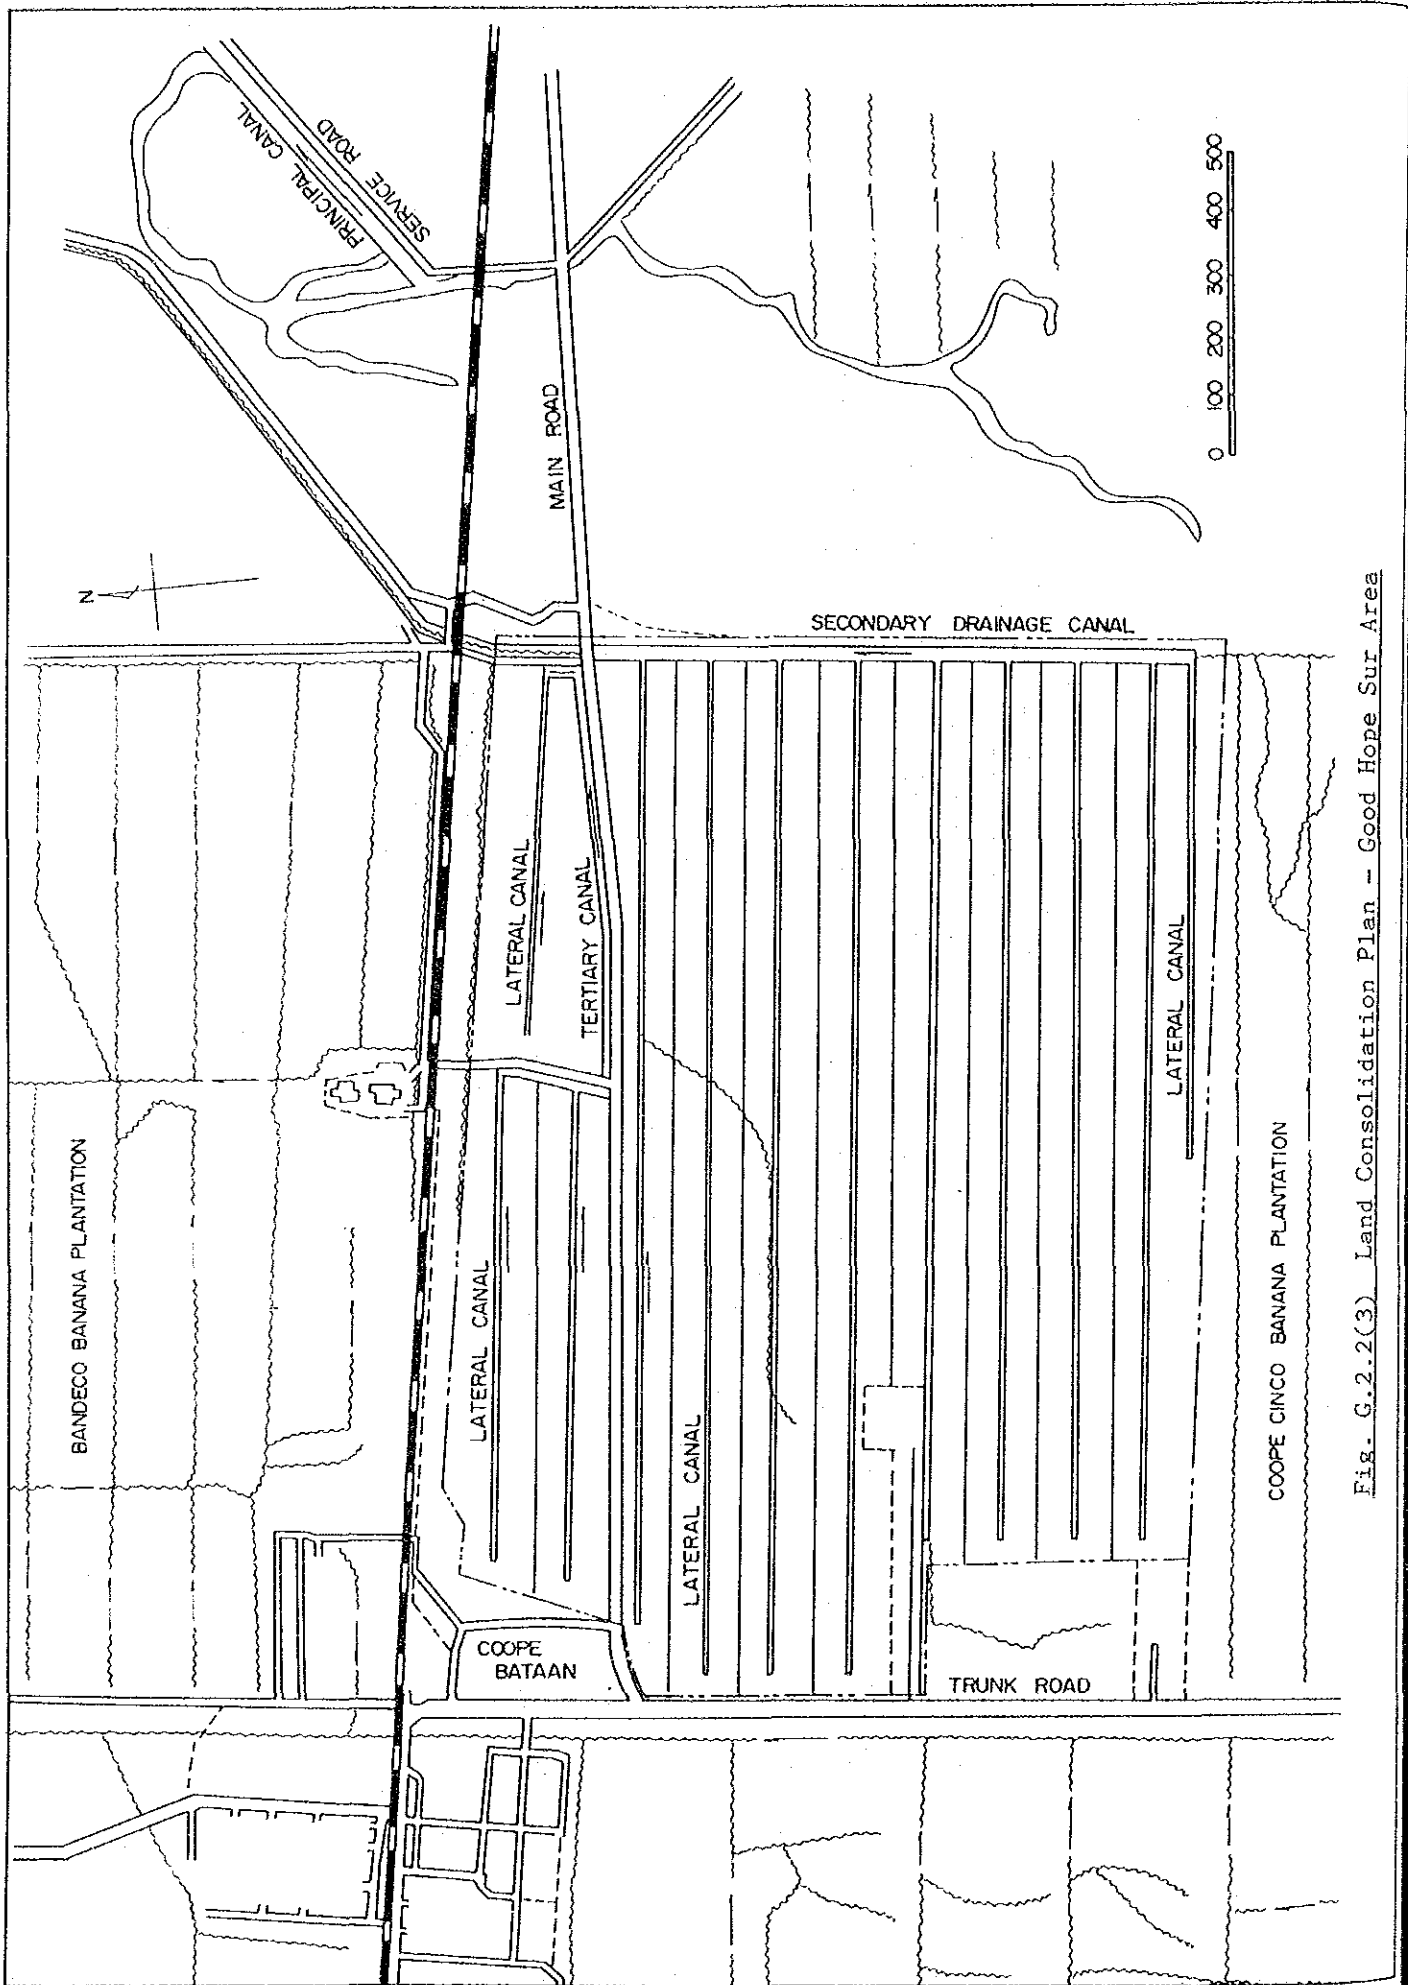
(3) Land Consolidation Plan - Good Hope Sur Area
